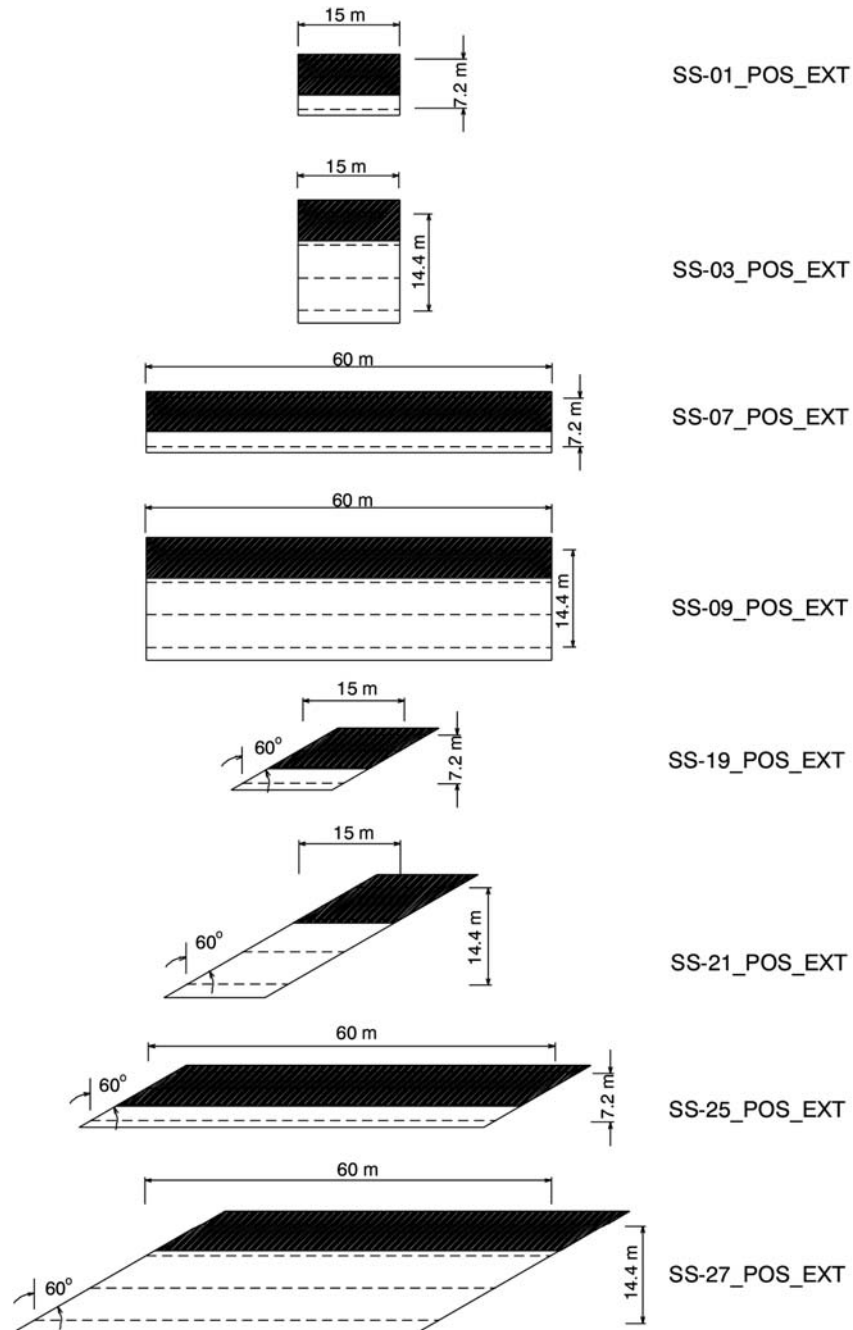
Lane load configurations, simple span, exterior girder, positive moment.
